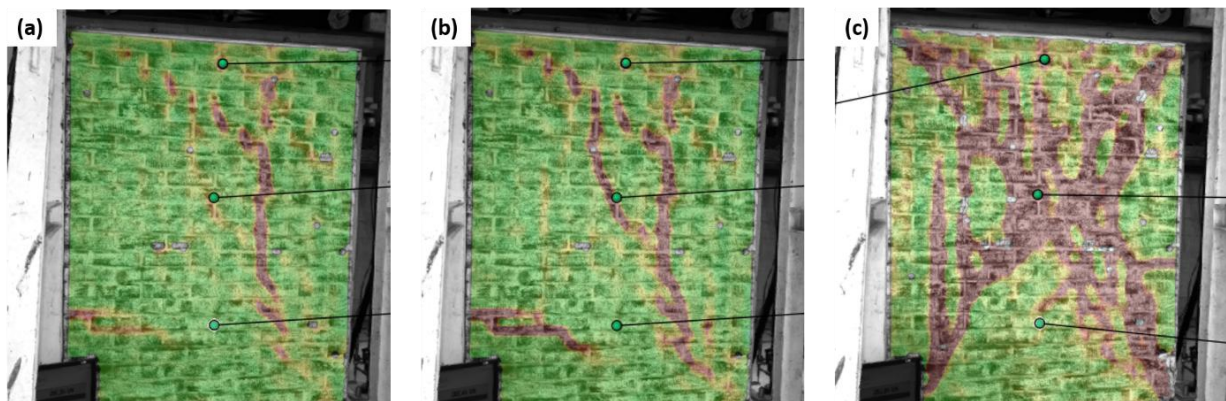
Initial crack formation (a), development of cracks at the base due to corner tension (b), and (c) crack pattern one cycle prior to failure for masonry wall HC_129_A_30.
